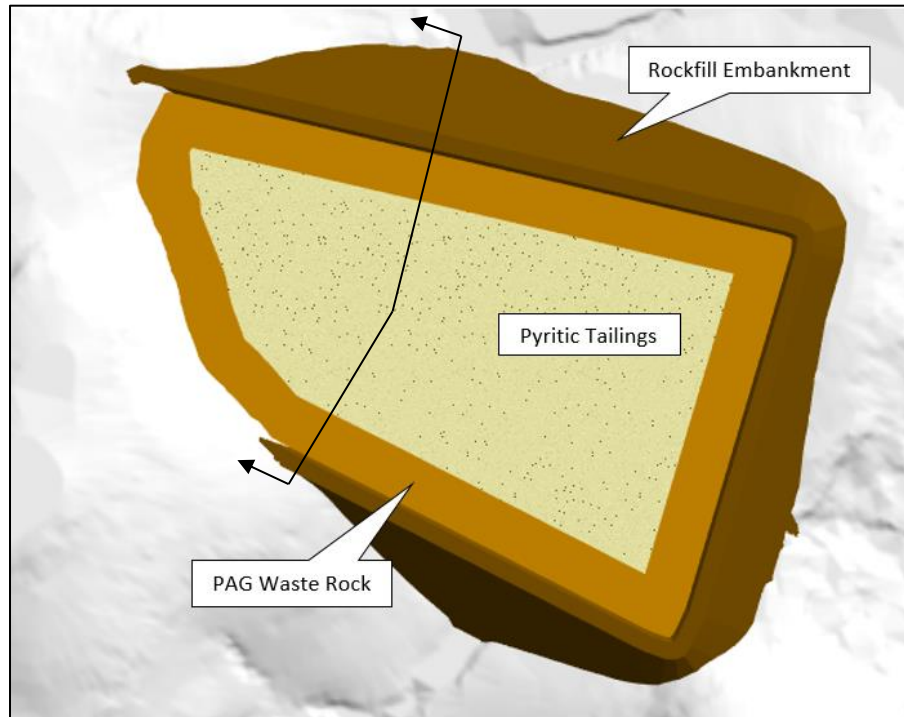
Conceptual Pyritic TSF Layout – Final
